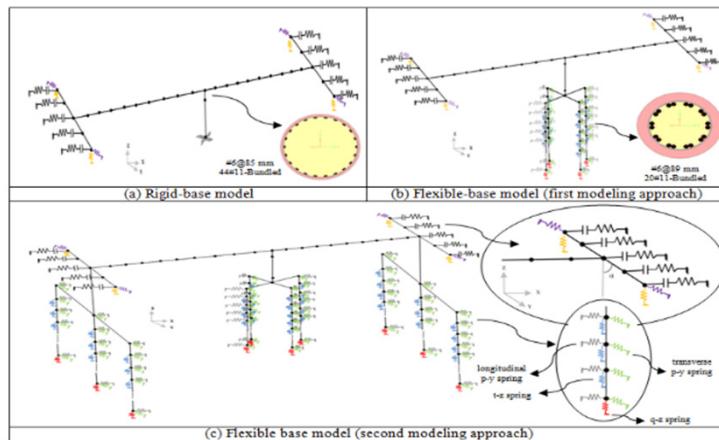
3D analytical finite element modeling scheme of the specimen bridge
